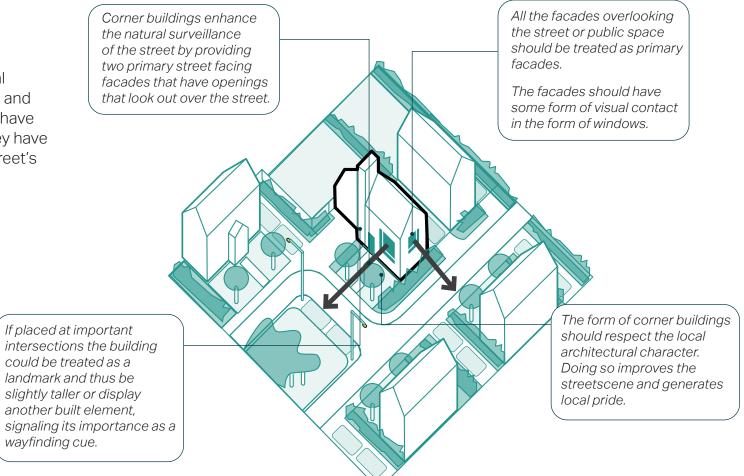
Diagram showing a corner building with windows on both street facing façades.
